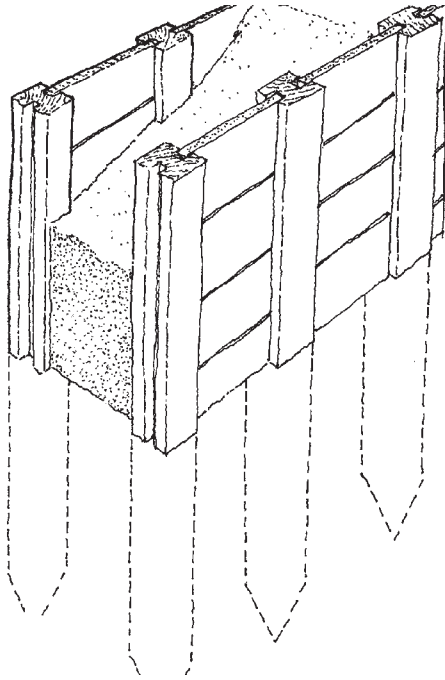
Grooved piles into which horizontal boards are slotted (C. J. Brandon).
